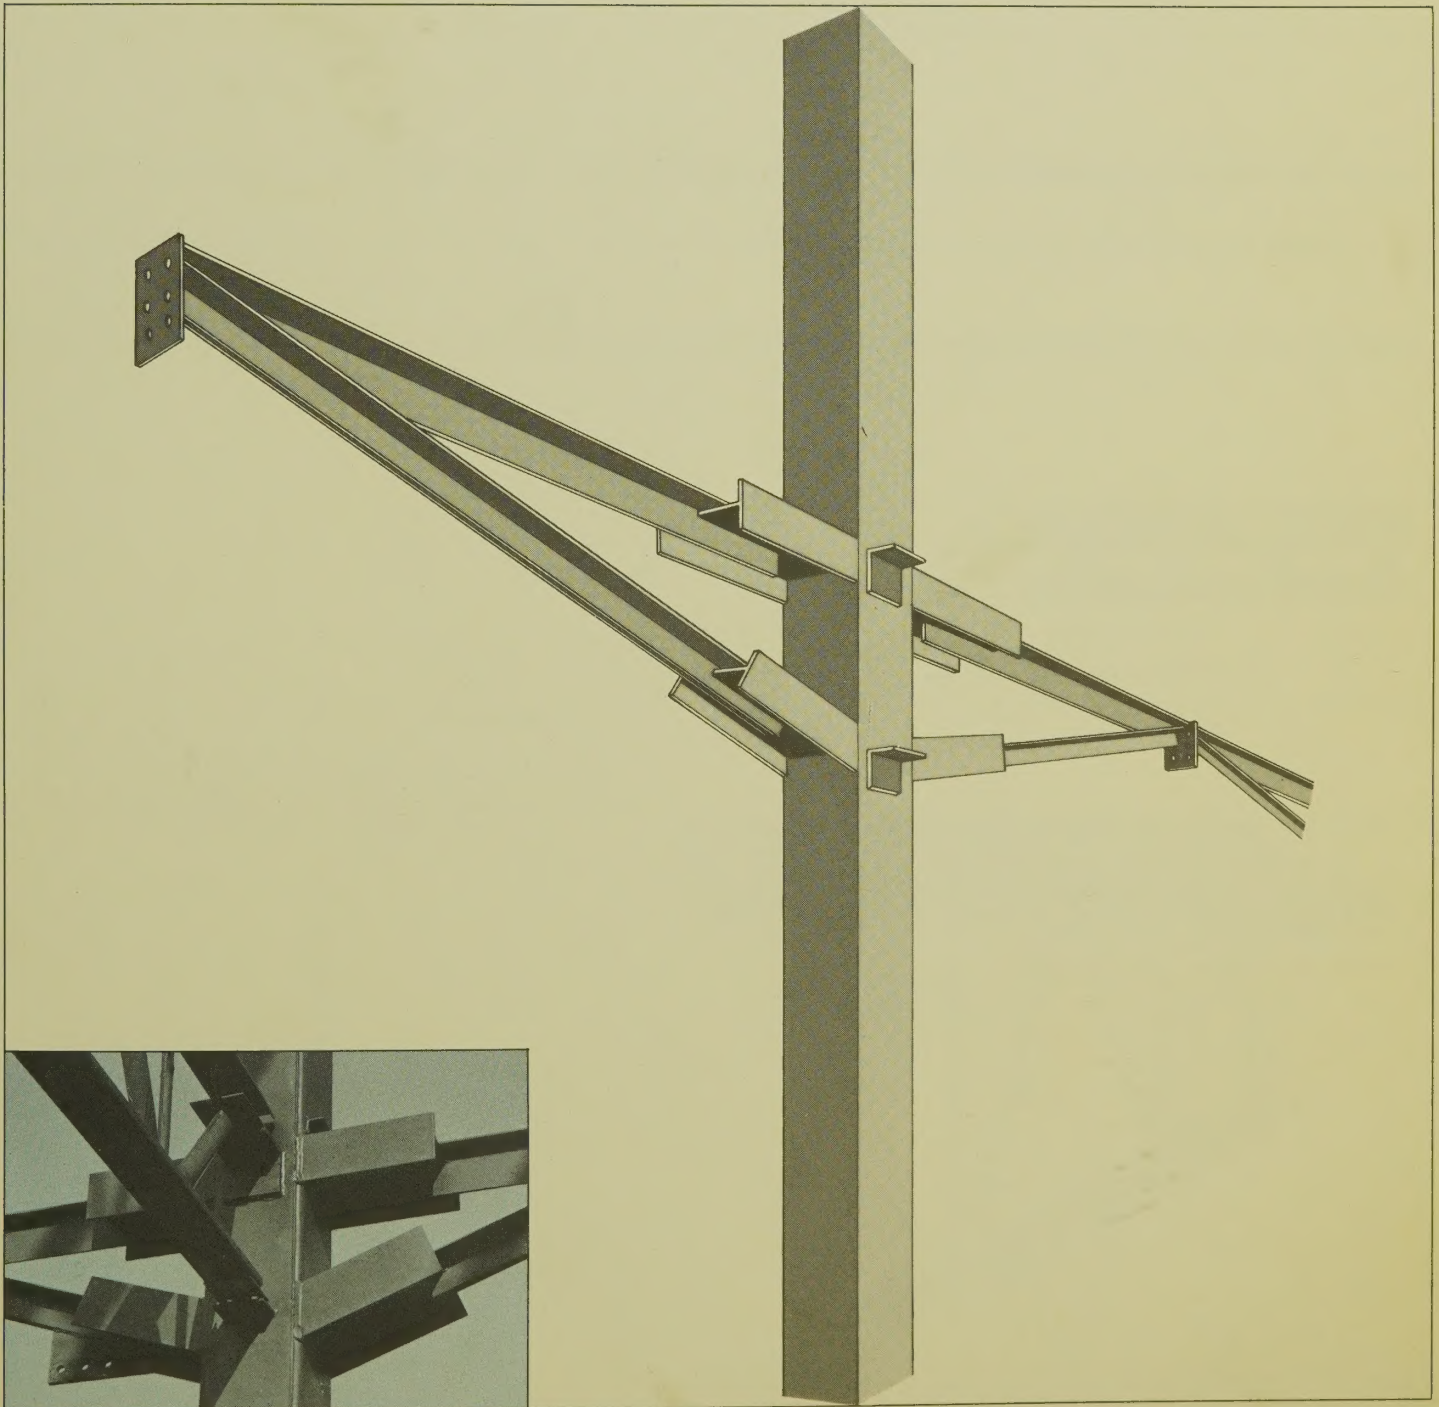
Prefabricated HSS column with spandrel ("tree" section).
